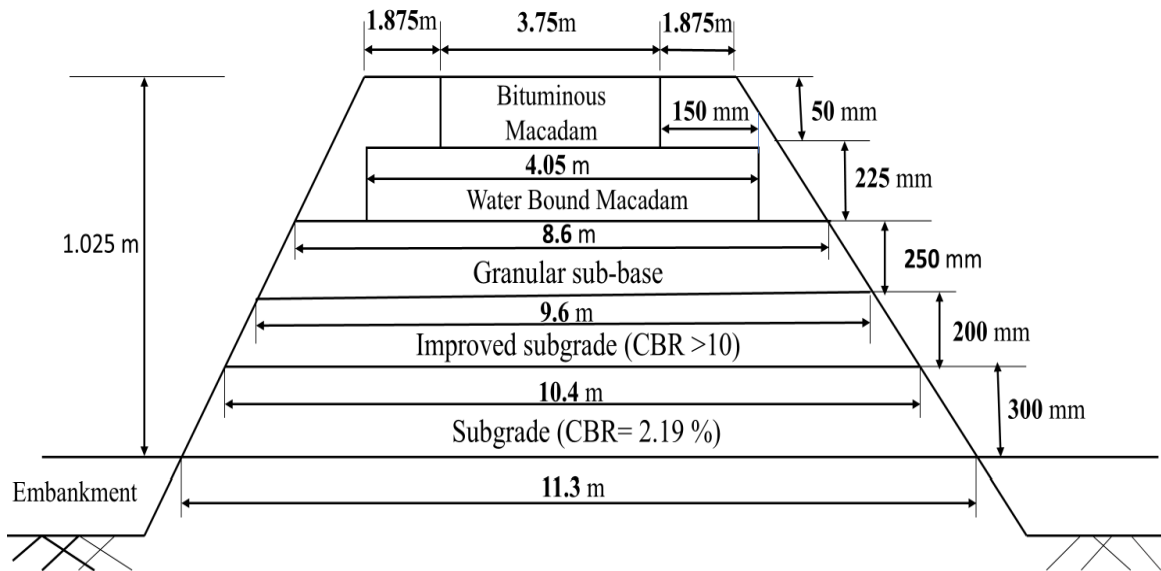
A typical cross section of pavement of clay soil with soaked CBR.
